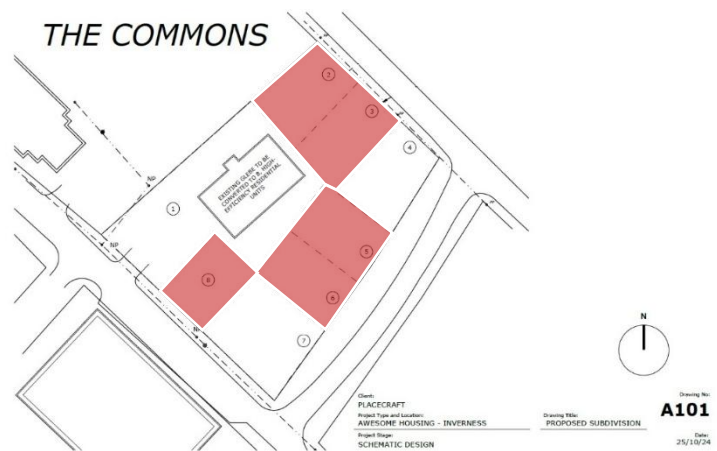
Site plan showing lots with proposed semi-detached dwellings
